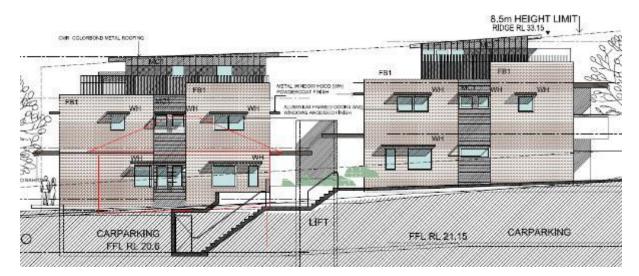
Eastern elevation plan extract showing minor 255mm breaches of the front and rear pavilion roof forms
